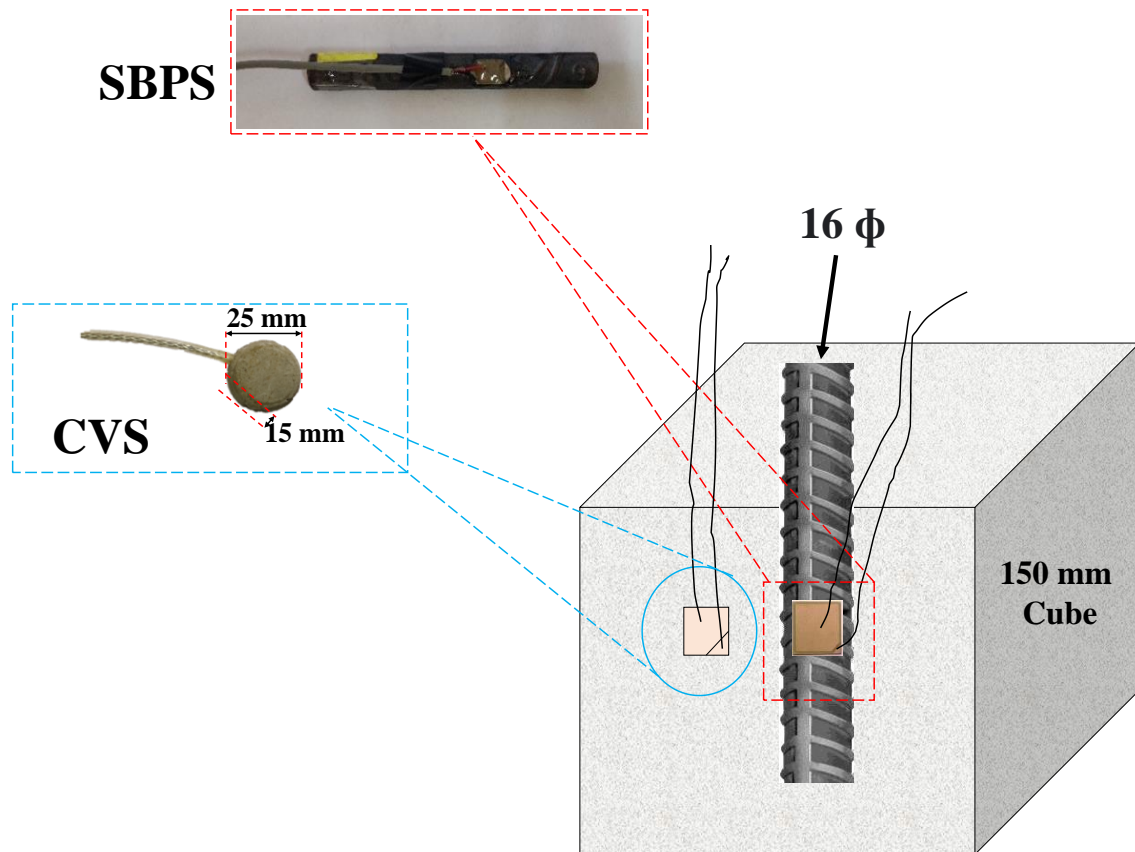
Detailed configuration of piezo sensor embedded in RC specimen (SBPS: Surface bonded piezo sensor; CVS: Concrete vibration sensor)
